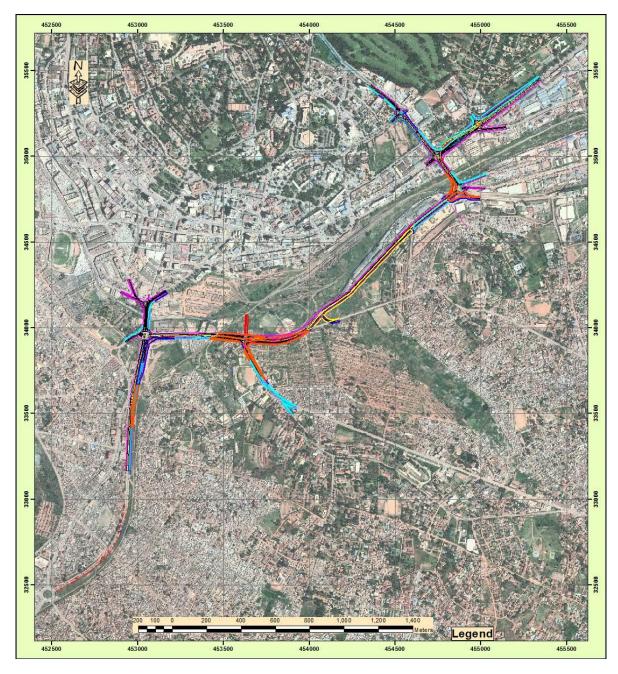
Entire Stretch of the Project Area and proposed road alignment
